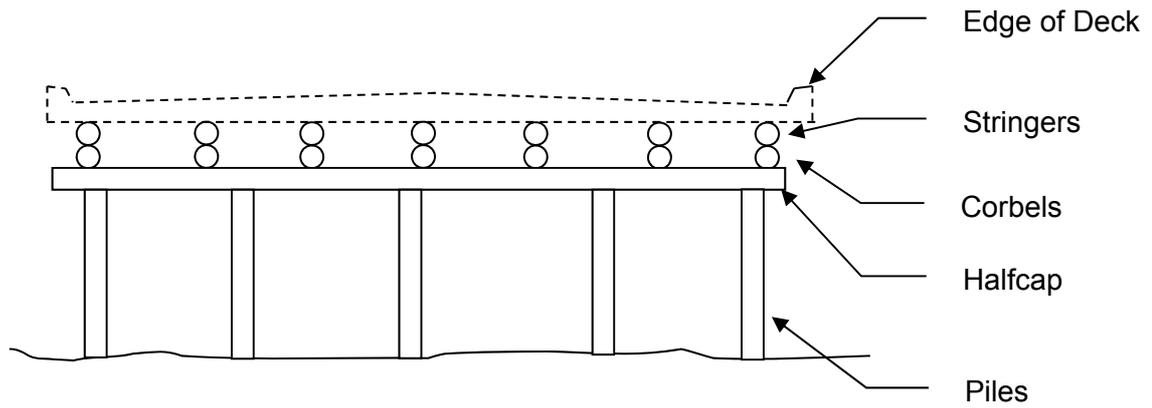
PIER ELEVATION, COMPONENT TERMINOLOGY
